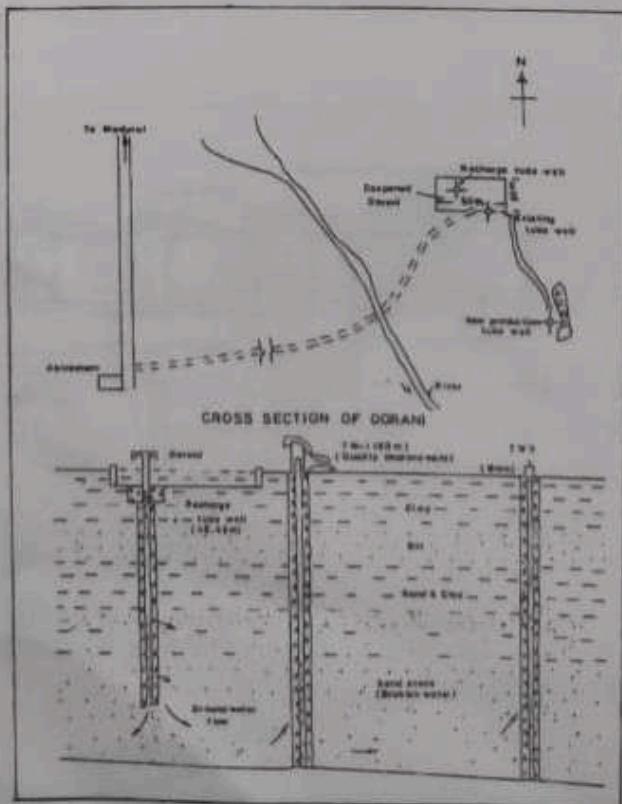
Recharge tube well in oorani Merku kottakudi site plan
